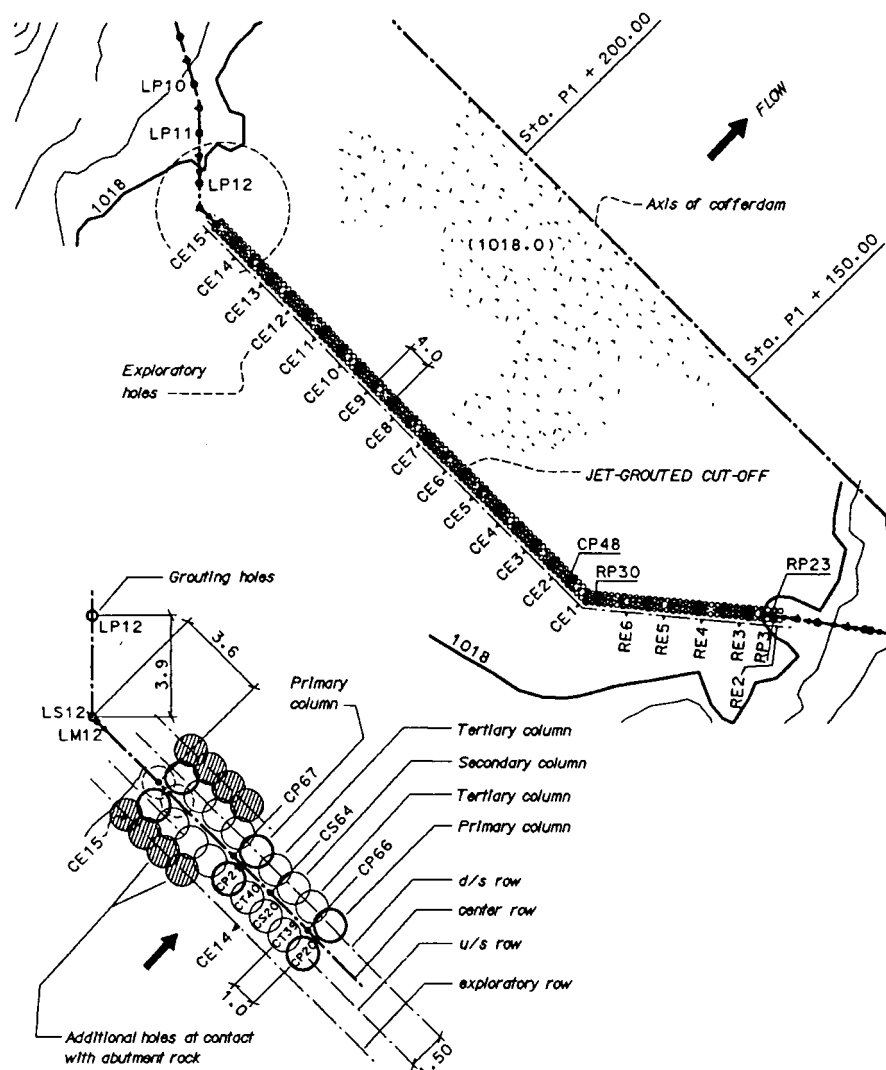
Lay-out of jet-grouted three-row cutoff for upstream cofferdam. Additional columns at contact with left abutment
